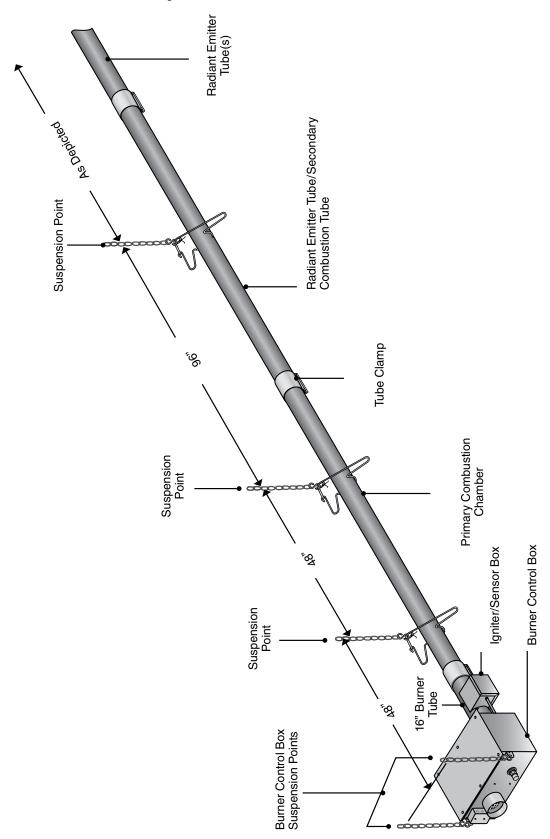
• Heater Suspension Layout • Four (4) Foot Truss Mounts
